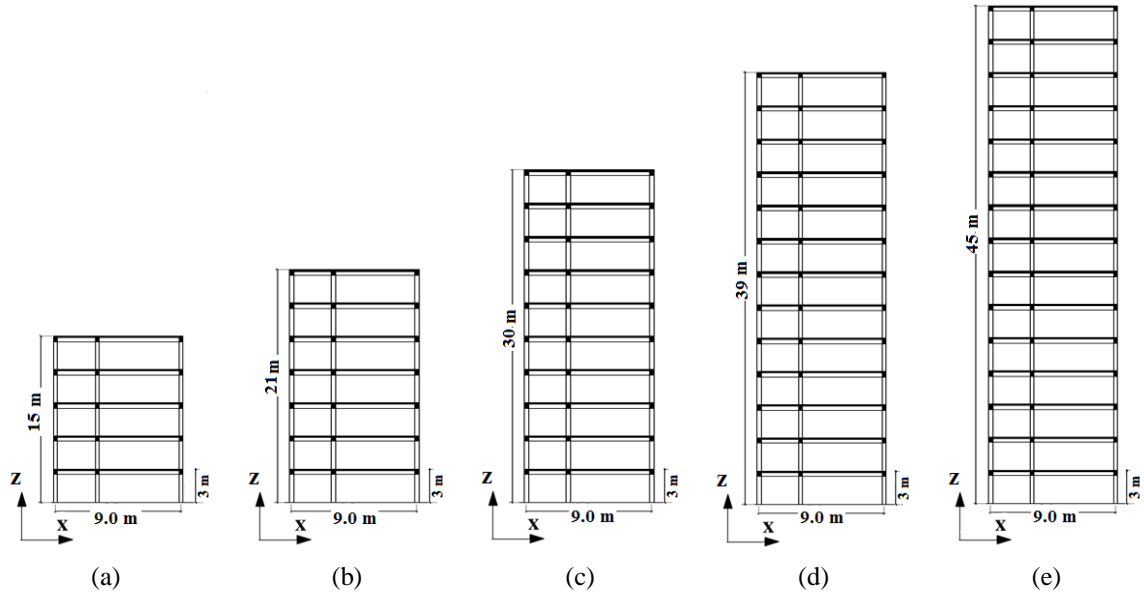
Elevation of the second group of the buildings (a) EC8 M5, (b) EC8 M7, (c) EC8 M10, EC8 M13, and (e) EC8 M15 (all dimensions are in metres).
